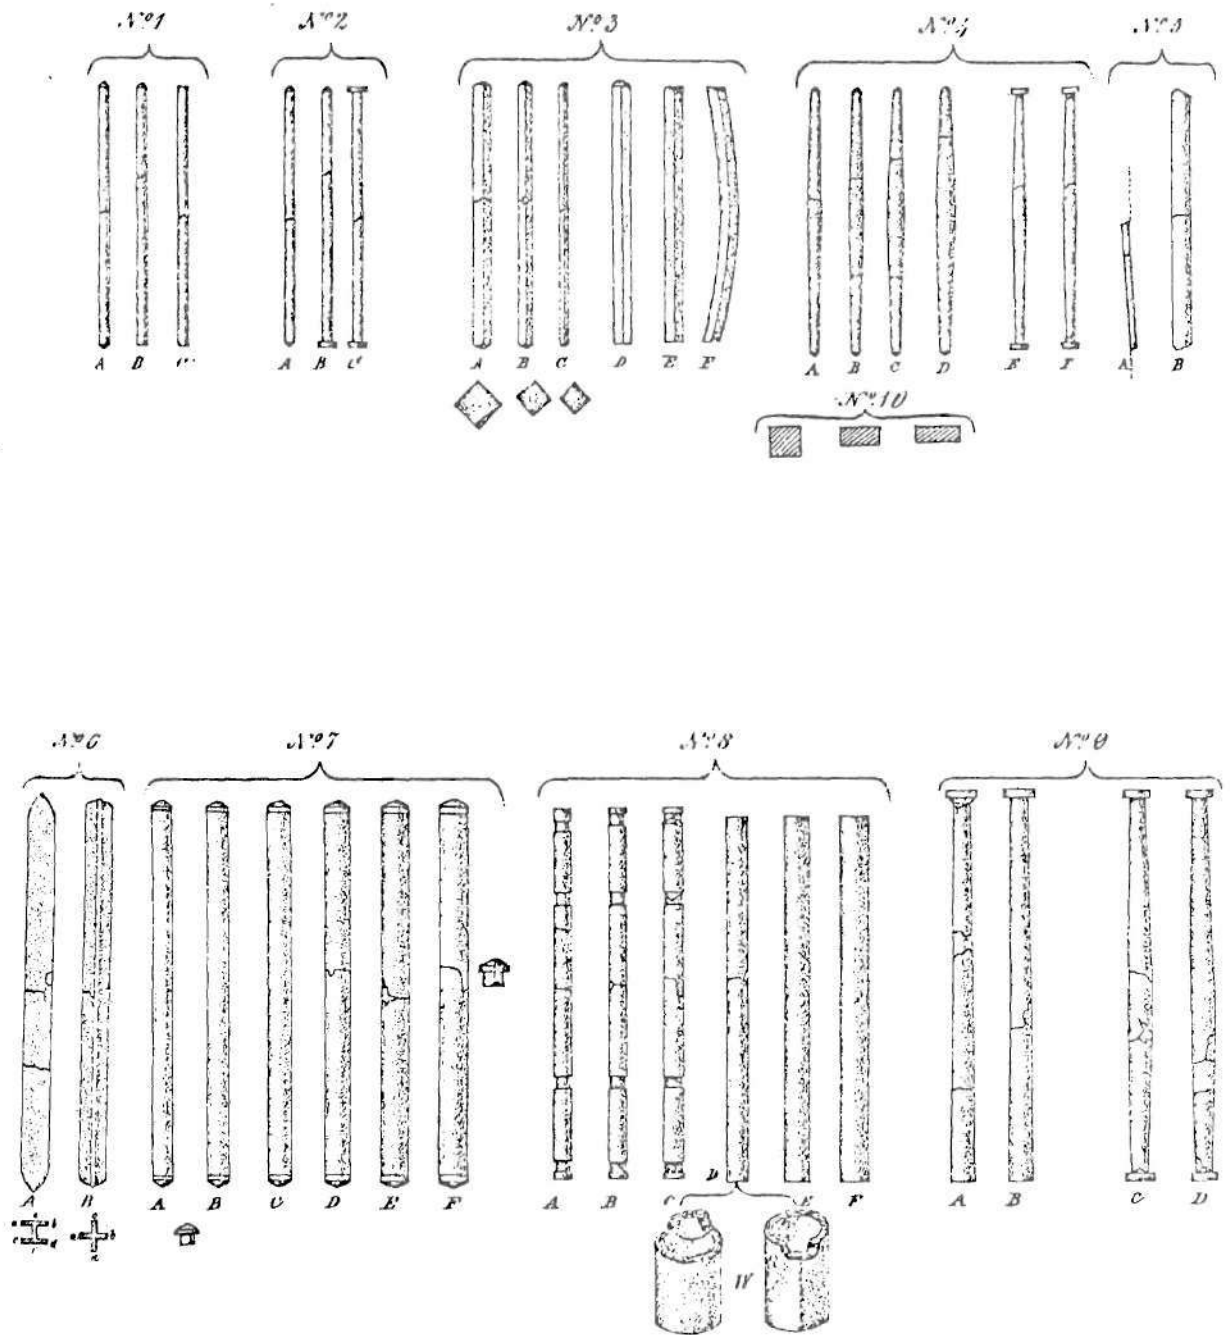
Hodgkinson's Specimens, Illustrating End Shapes
